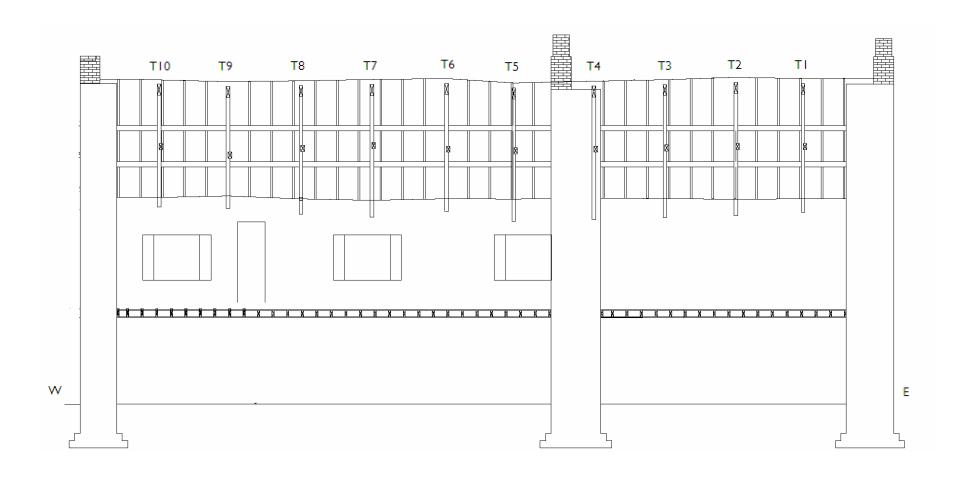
Section through building, showing truss numbering (Morton & Hall Consulting Ltd)
